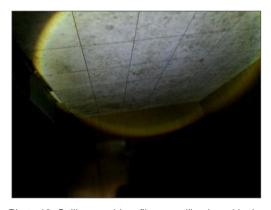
Ceiling mould on fibrous ceiling board in the basement (Loc. 10).
